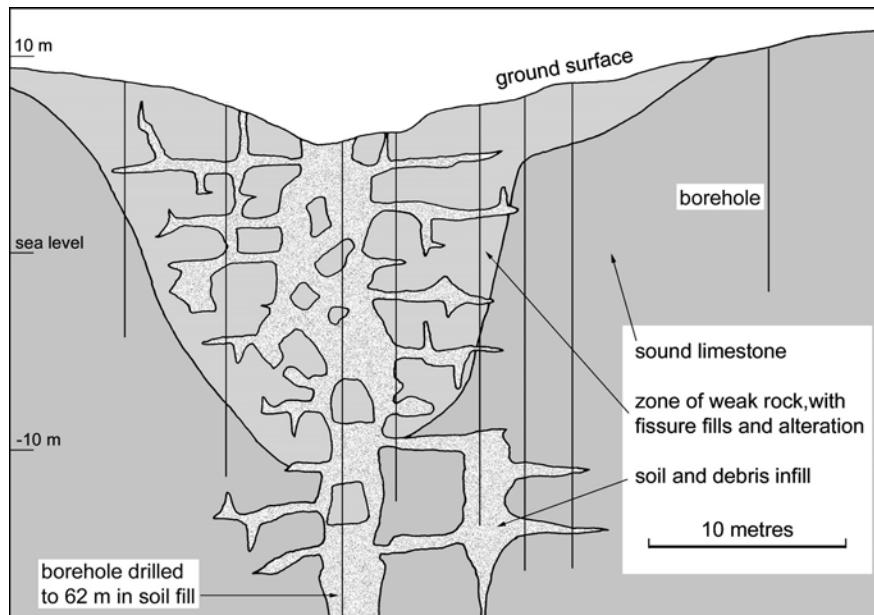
Schematic section through a large buried sinkhole found in limestone under a construction site near Limerick, Ireland.
